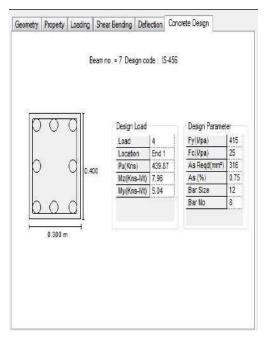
Diagram of Reinforcement Detailing of Column
